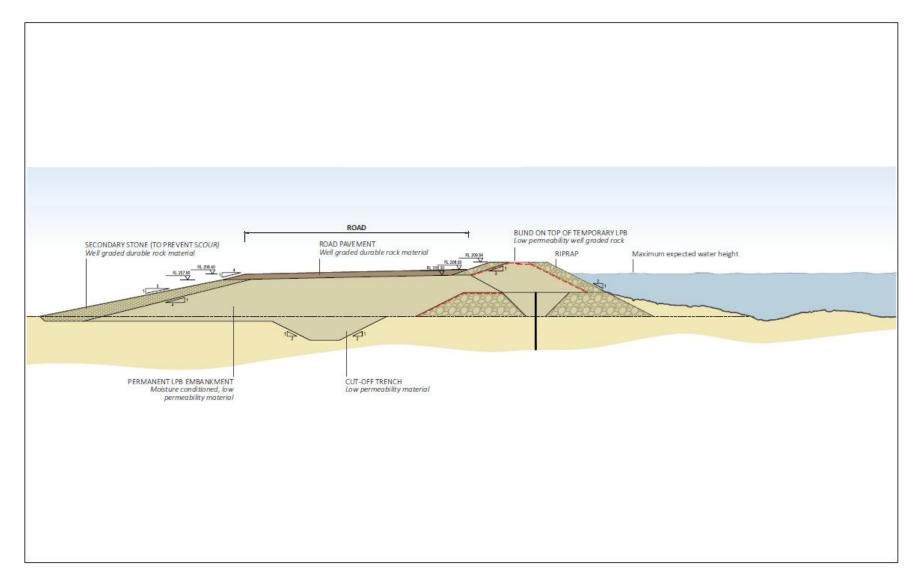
Final LPB design cross section integrating temporary isolation bund and final LPB
